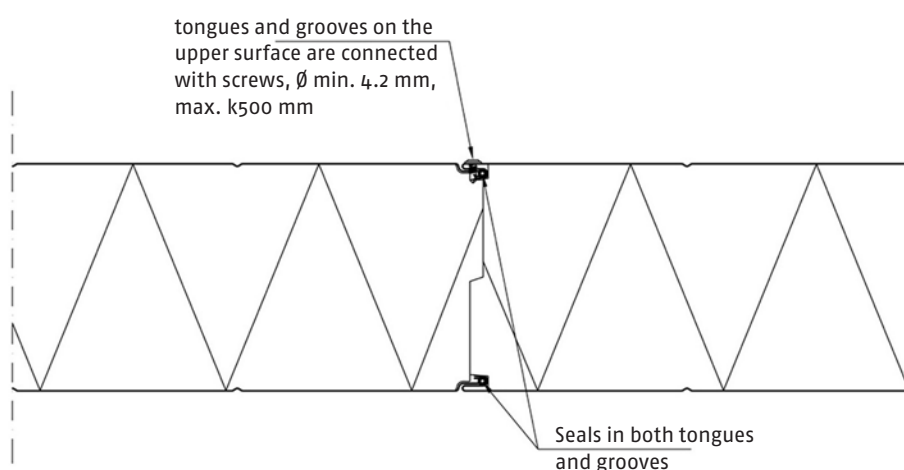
Fastening and sealing of panel joints in a compartmenting ceiling structure.
